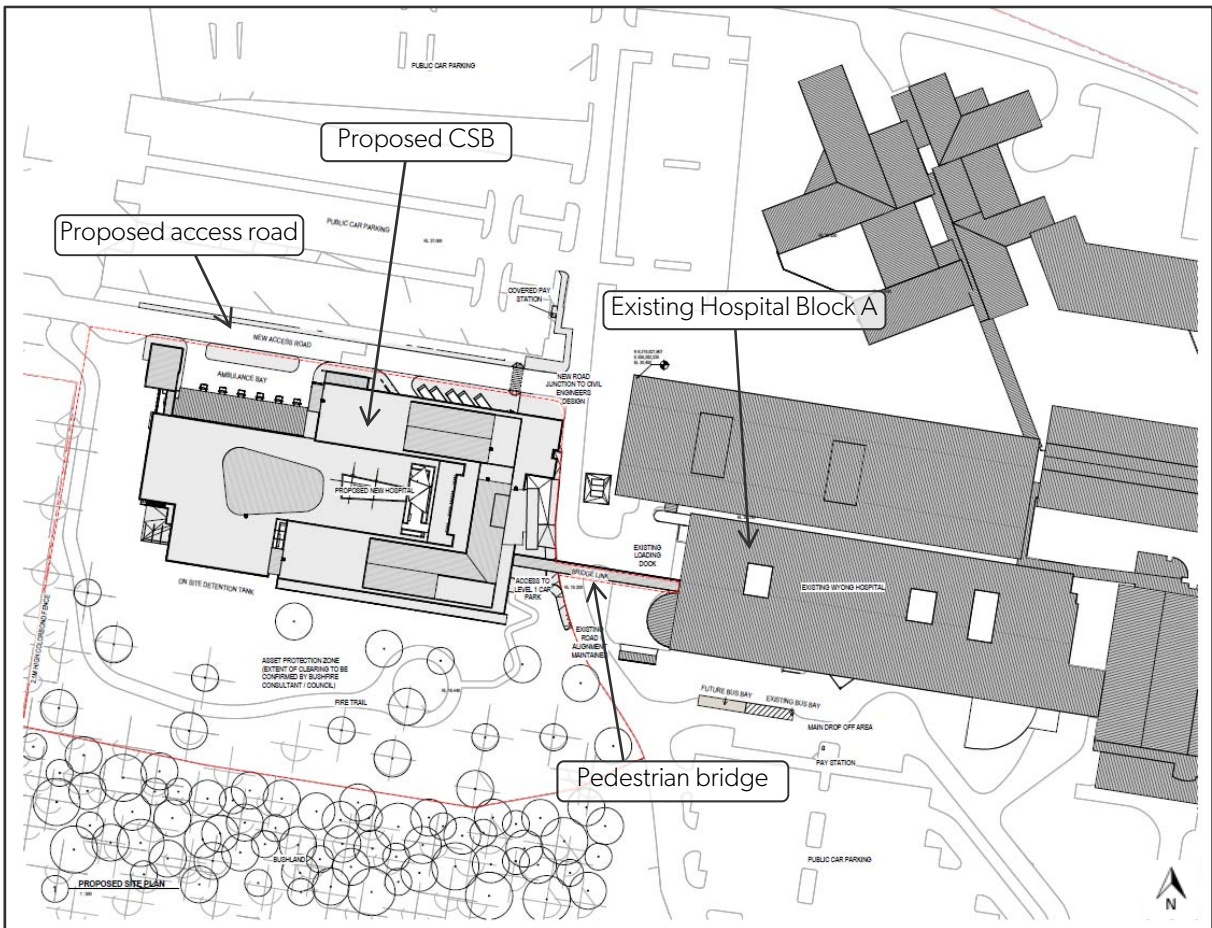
| Proposed site plan (Source: Applicant's RtS)
